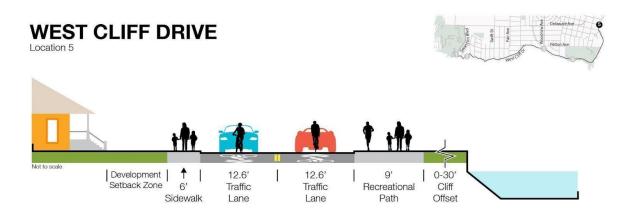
Alternative 1 Enhancements at Cross Section of Santa Cruz St and West Cliff Drive
